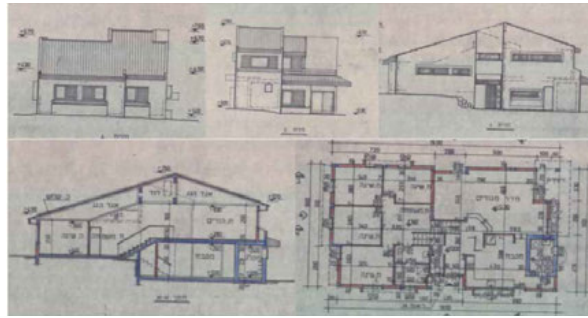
A model House - upper row: main facade to street, backyard façade, side façade. Lower row: Section (Note the family area in the lower part and the bedrooms area in the upper one, oriented towards the street); Plan. Gil-Ad & Yosef Architects.
